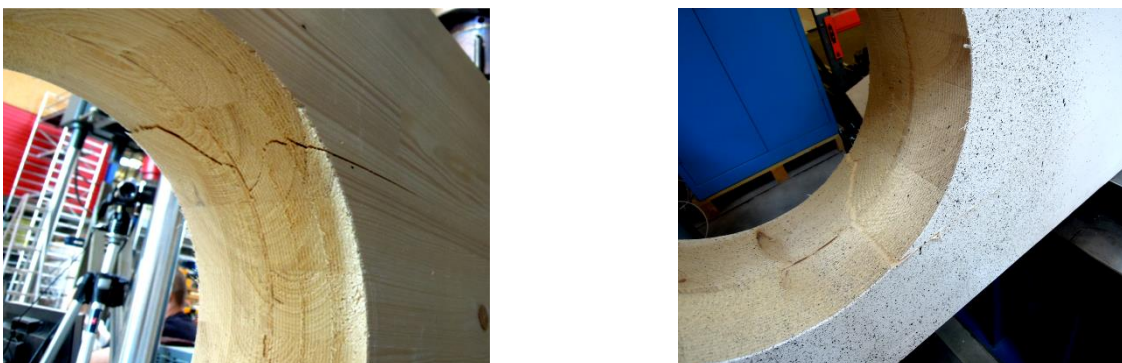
Cracks due to tensile stress perpendicular to the grain on the upper left opening edge (left) and on the lower right opening edge (right) for specimen C02
